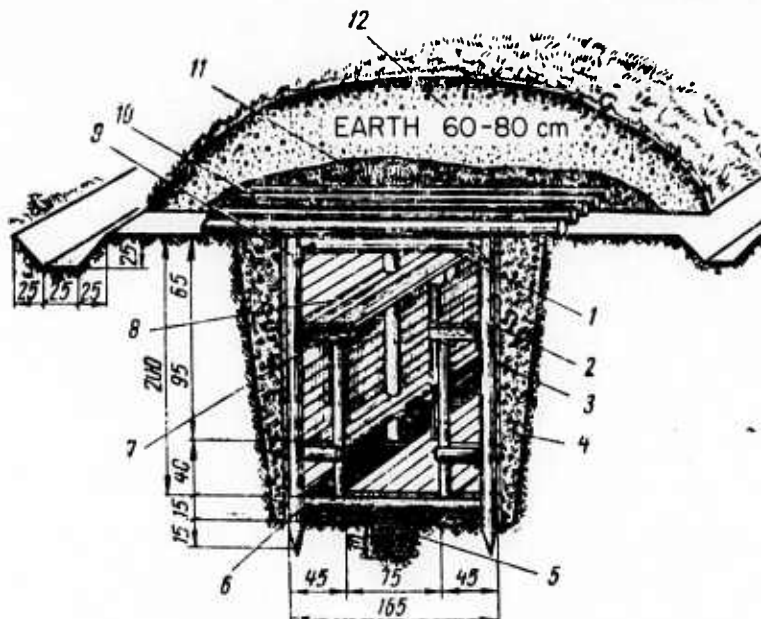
Dugout: (1) cross braces (diam 16 cm); (2) support (diam 16 × 90 cm); (3) lining of boards, logs, or split poles; (4) compacted clay; (5) drainage; (6) cross braces (diam 12 cm); (7) planks (5 × 10 cm); (8) boards (25 cm); (9) brackets; (10) roofing (diam 16 cm); (11) compacted clay (20 cm); (12) earth covering (60–80 cm); (13) sod.
